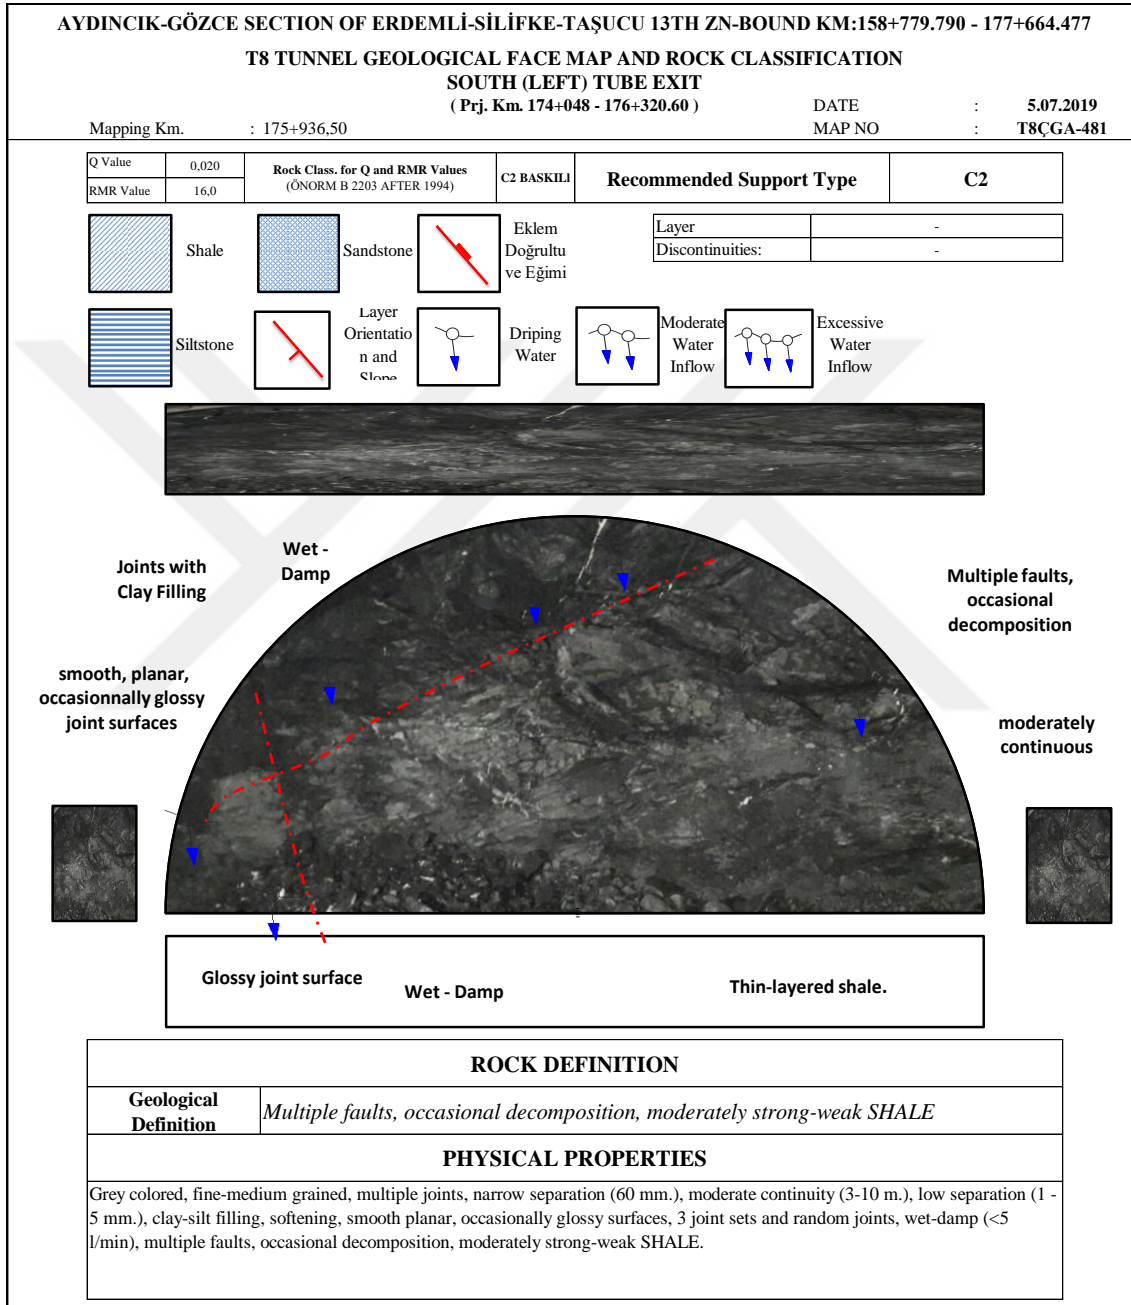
T-8 south Km. 175+936.50 tube Q 0.020 and RMR 16, C2 tunnel face
